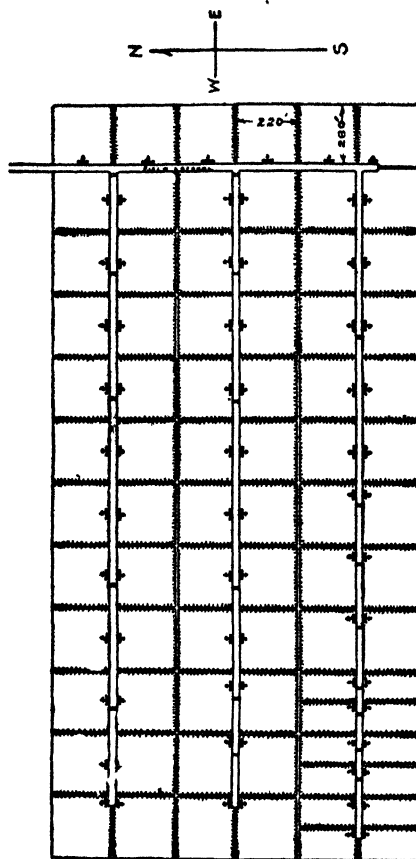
LAYING OUT RECTANGULAR CHECKS ON FARM OF T. K. BEARD, MODESTO, CAL.
